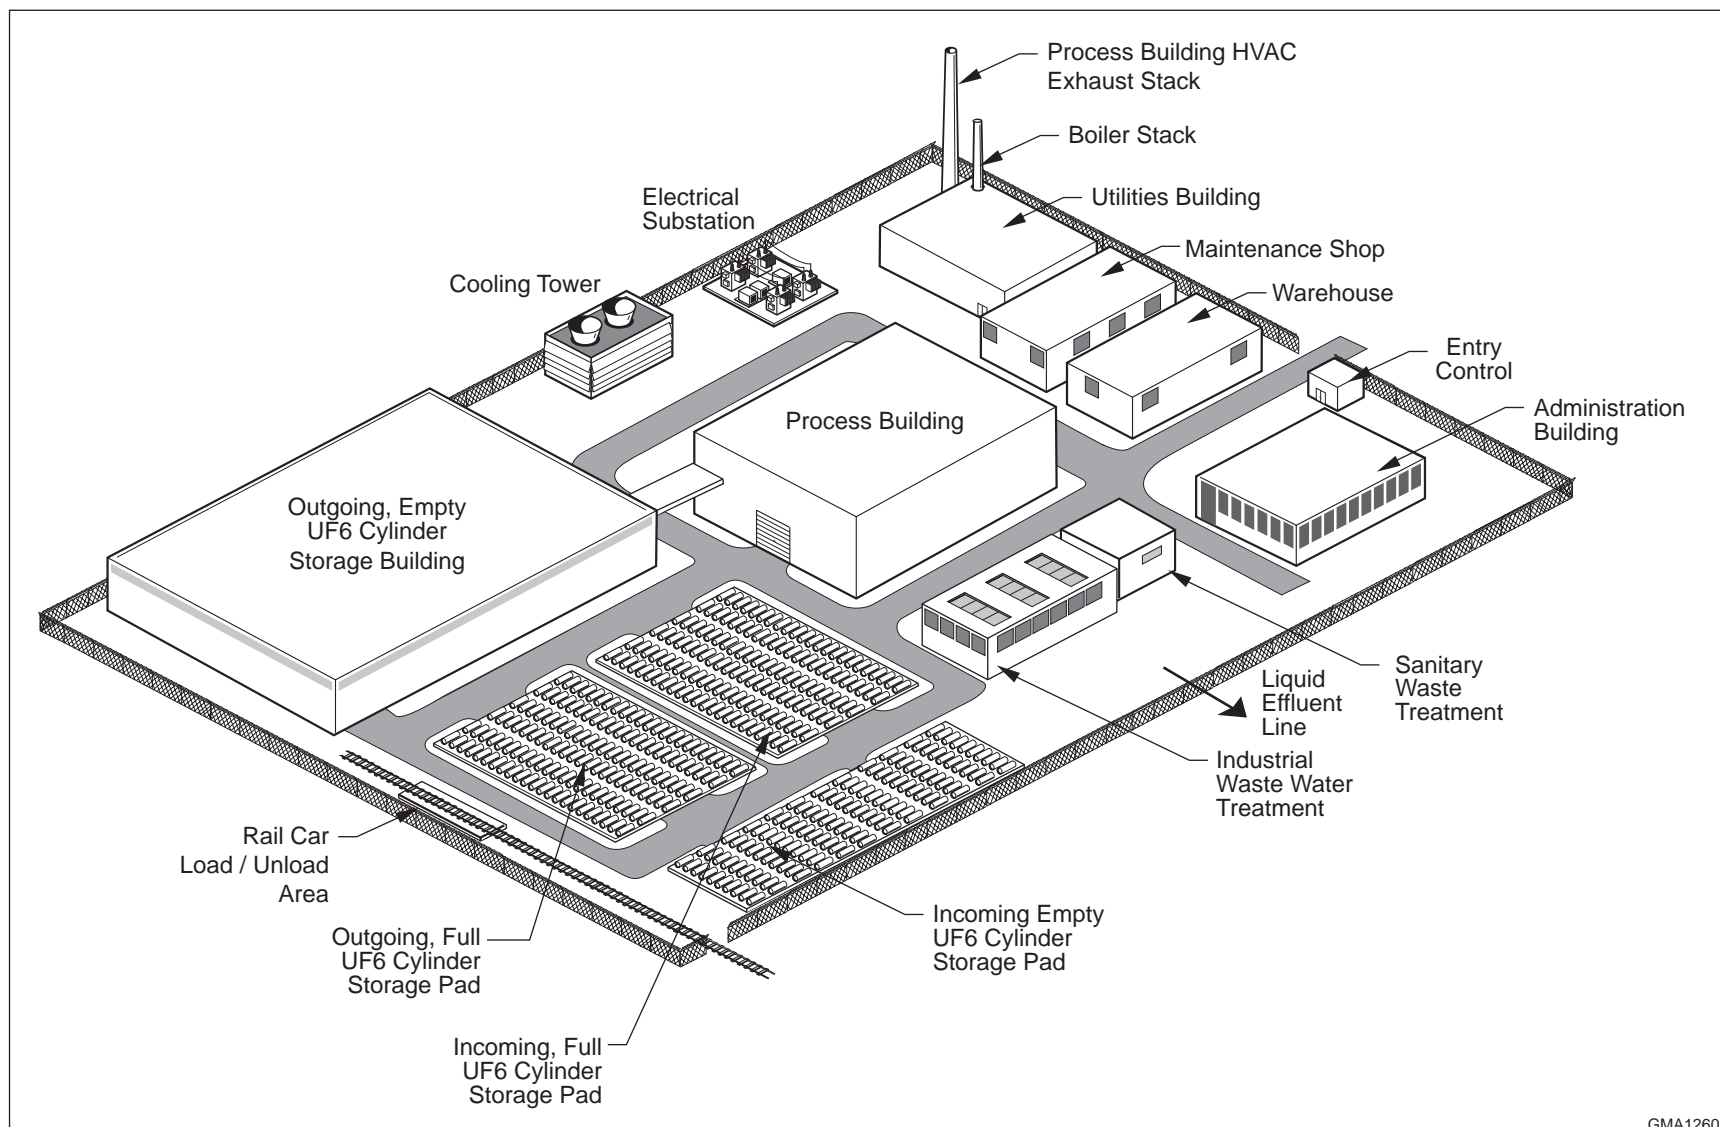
Representative Layout of a Transfer Facility Site (Source: LLNL 1997)
